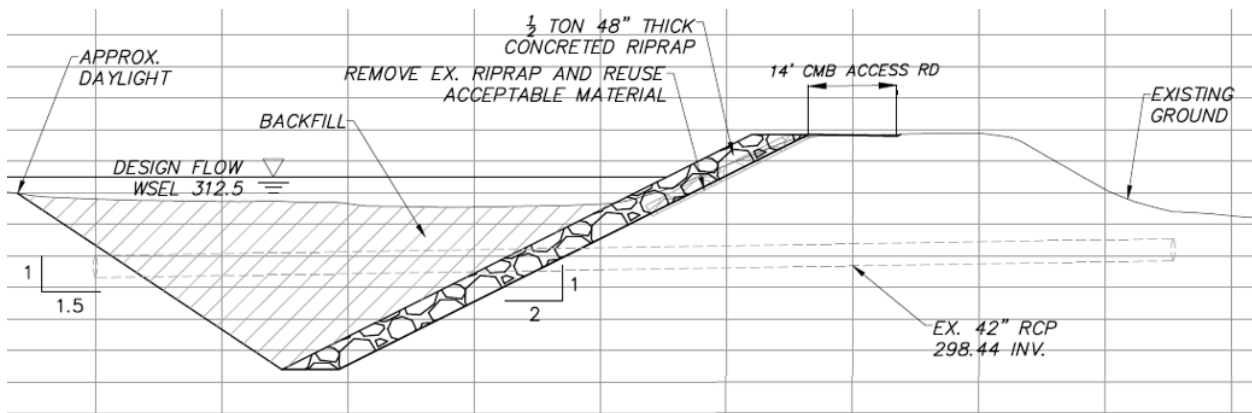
Alternative 2B – Typical Section (Reach IV)
